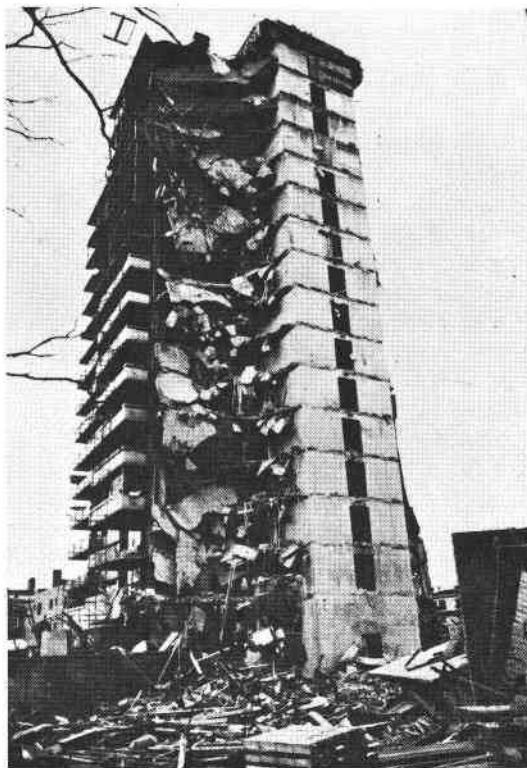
Collapse of reinforced concrete building under construction, Boston, 25 Jan. 1970 (Wide World Photos) (see also Allen and Schriever 1972).
